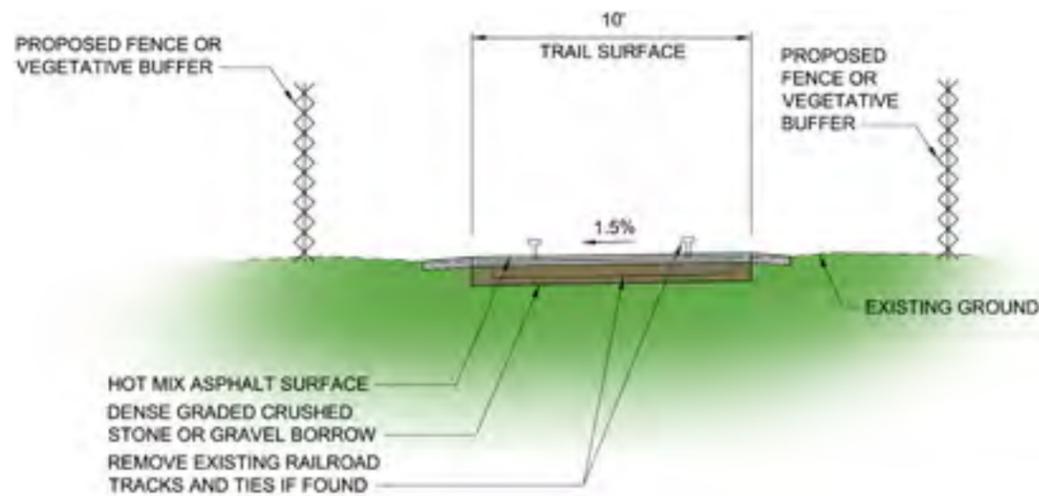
SECTION D-D: TYPICAL TRAIL WITH ABUTTER SCREENING
